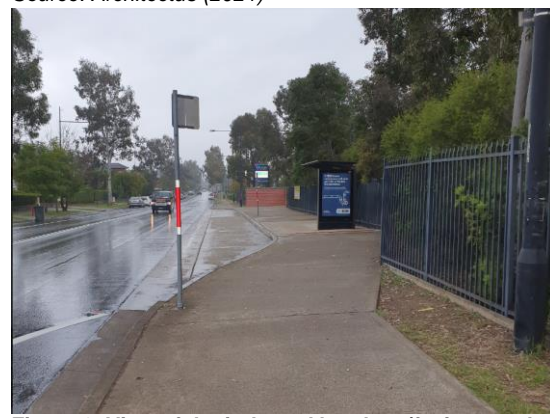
View of the indented bus bay (facing south on The Ponds Boulevard)
